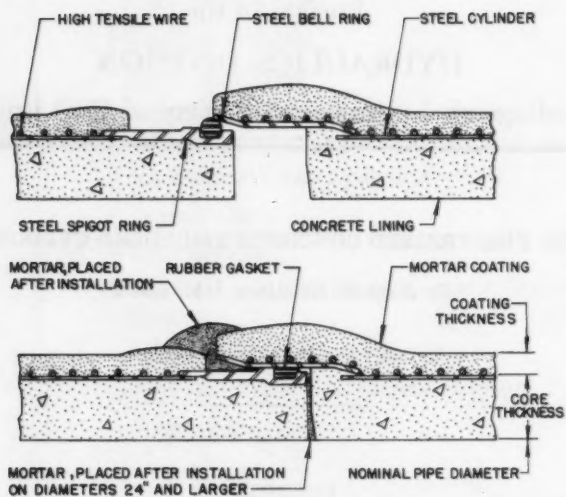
PRESTRESSED CONCRETE CYLINDER PIPE
